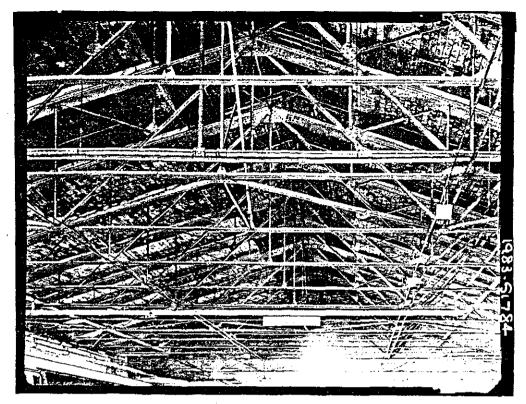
Stamford Street Railroad Company Trolley Barn: Interior, illustrating monitor roof and trusswork.
